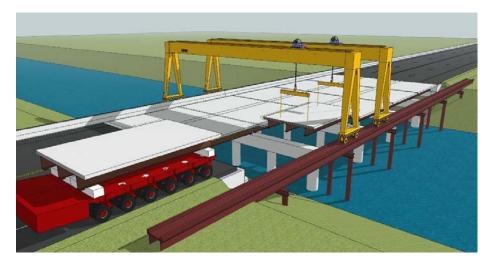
Transverse Gantry Crane Installation Technique
